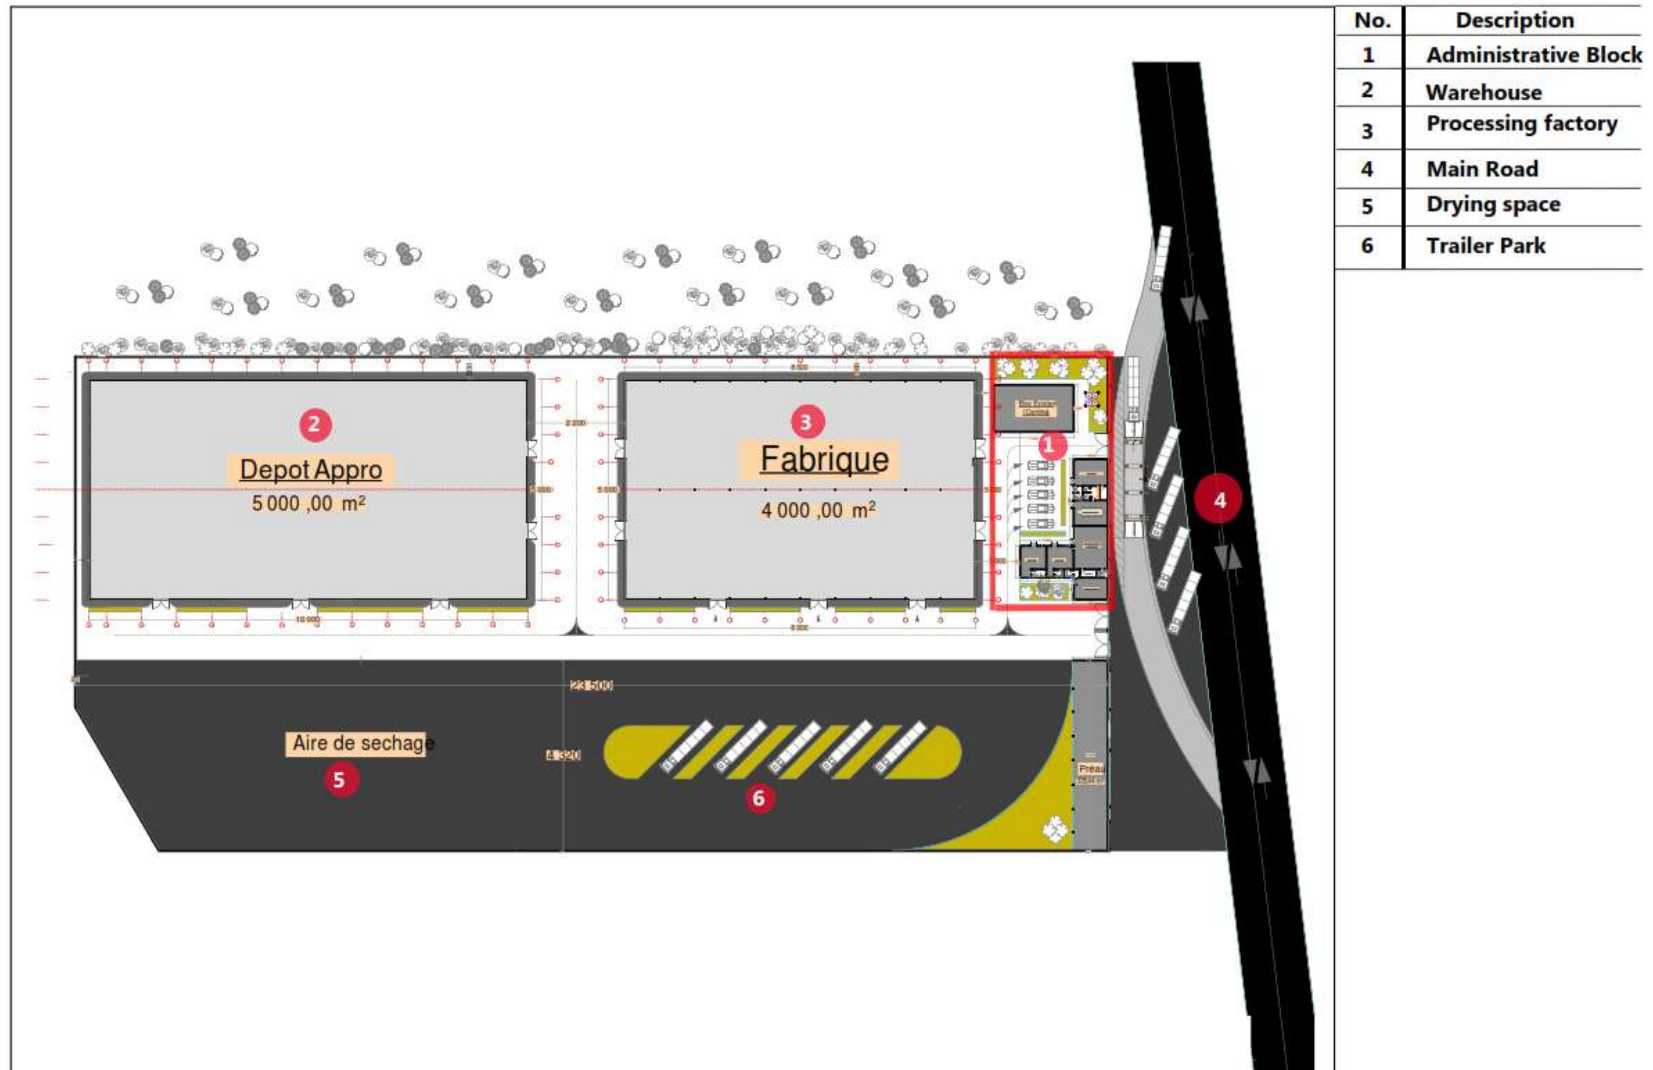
Layout Plan of the cashew nut processing plant showing the different sections of the facility
